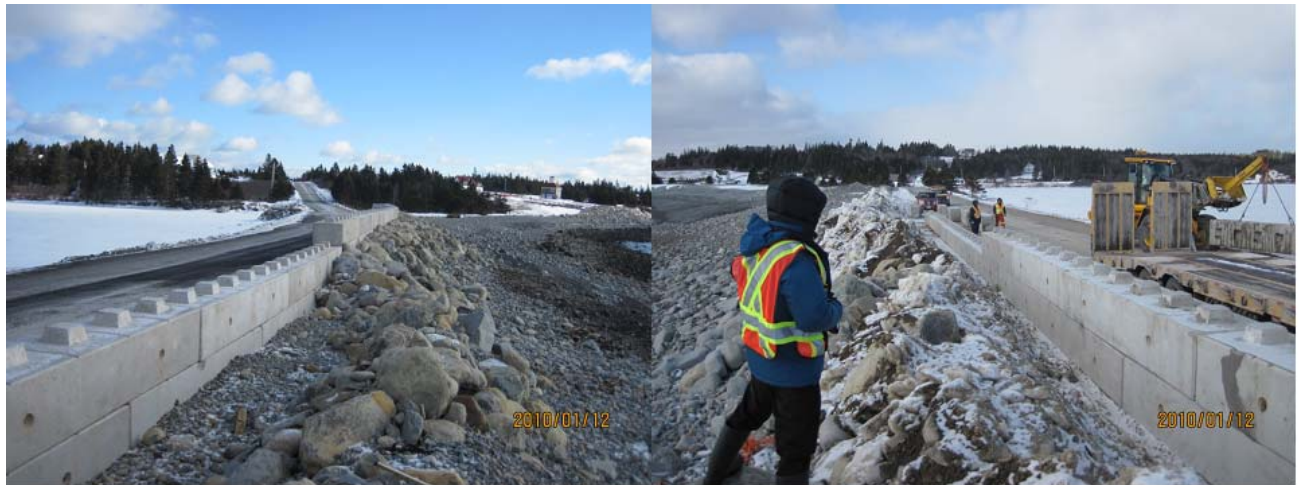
Installation of concrete block retaining wall near Profile 2 Western Head
